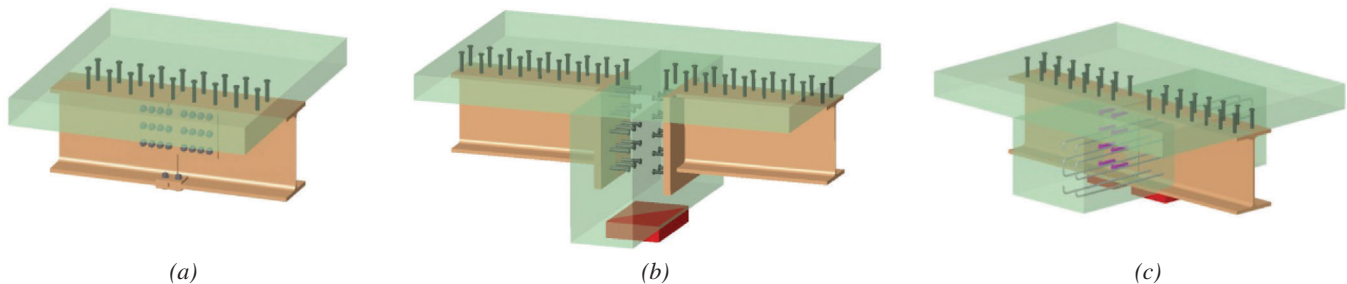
Connection solutions, slab reinforcement not shown for clarity: (a) bolted connection with direct contact; (b) butt-plate connection; and (c) embedded connection (figure courtesy of Professors Mohammed Hjiaj and Alain Lachal).
